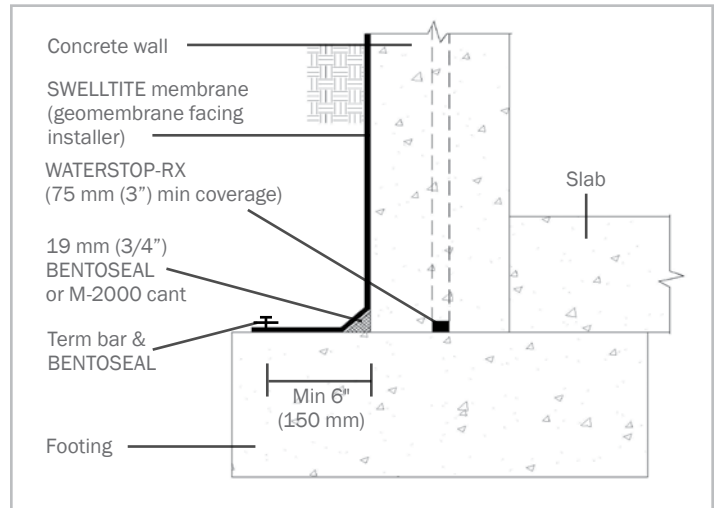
Concrete wall/footing joint (non-hydrostatic)
